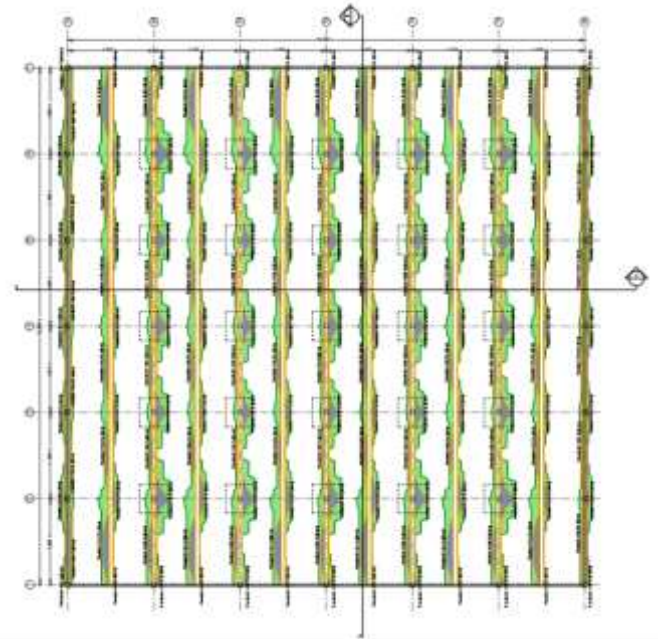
Reinforcement profile B for Flat Slab 6x6m.
